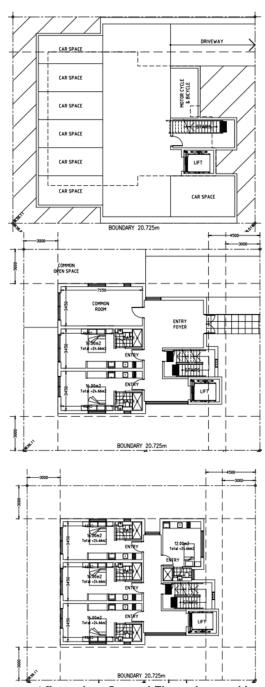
Basement floor plan, Ground Floor plan, and Level 1-3 floor plan of schematic development on 66A Caledonian Street
